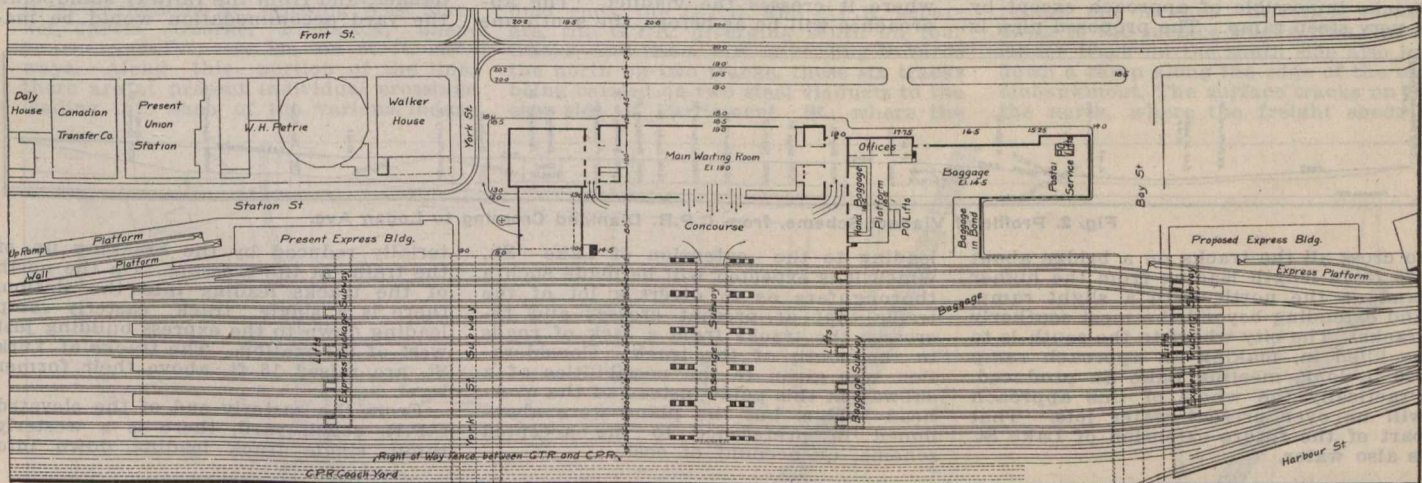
Plan of New Union Station, showing the Trackage, and Passenger and Baggage Facilities.
